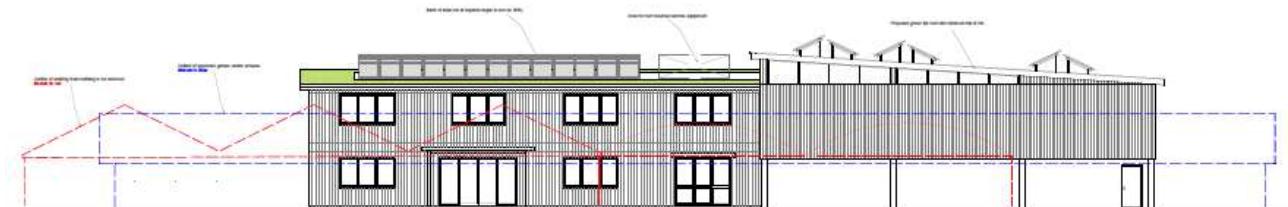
Southern elevation with outline of existing (in red) and approved (blue) garden centre buildings shown
